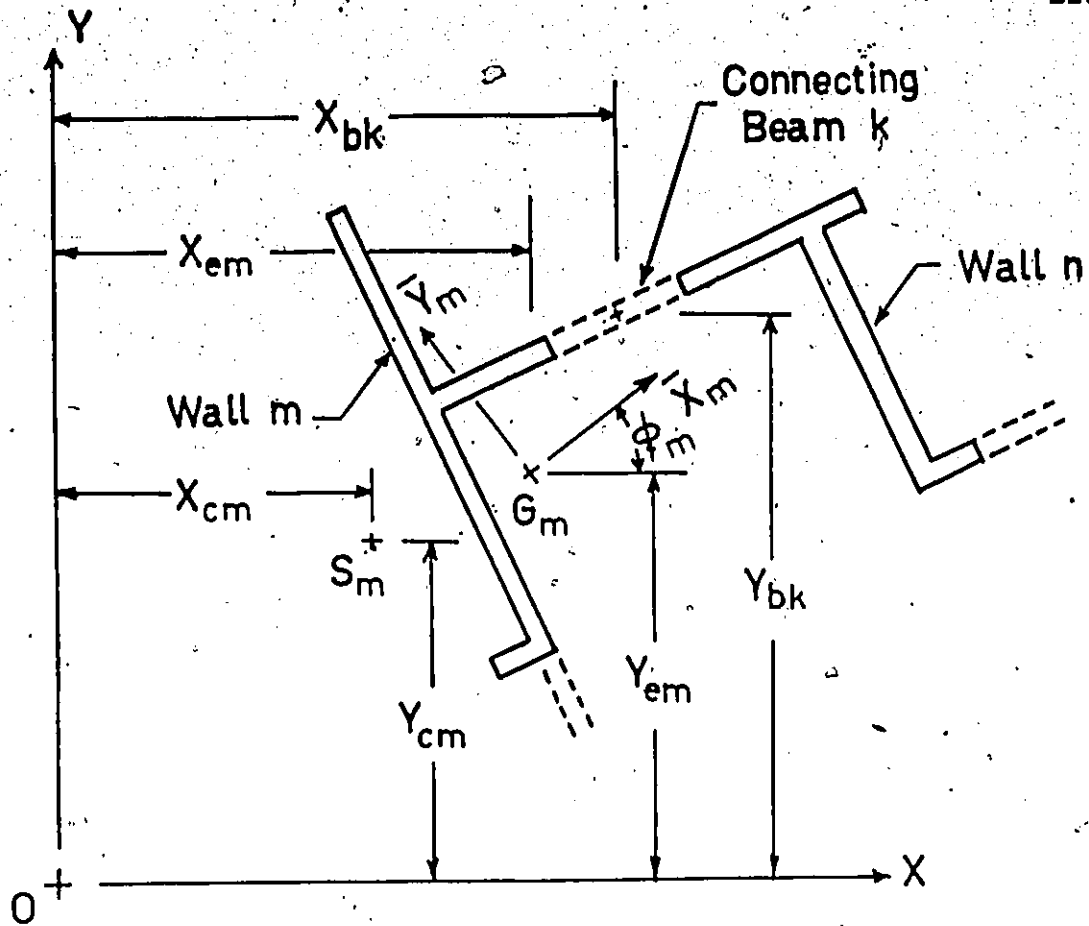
GEOMETRY OF SHEAR WALLS WITH TYPE 1 CONNECTING BEAM
